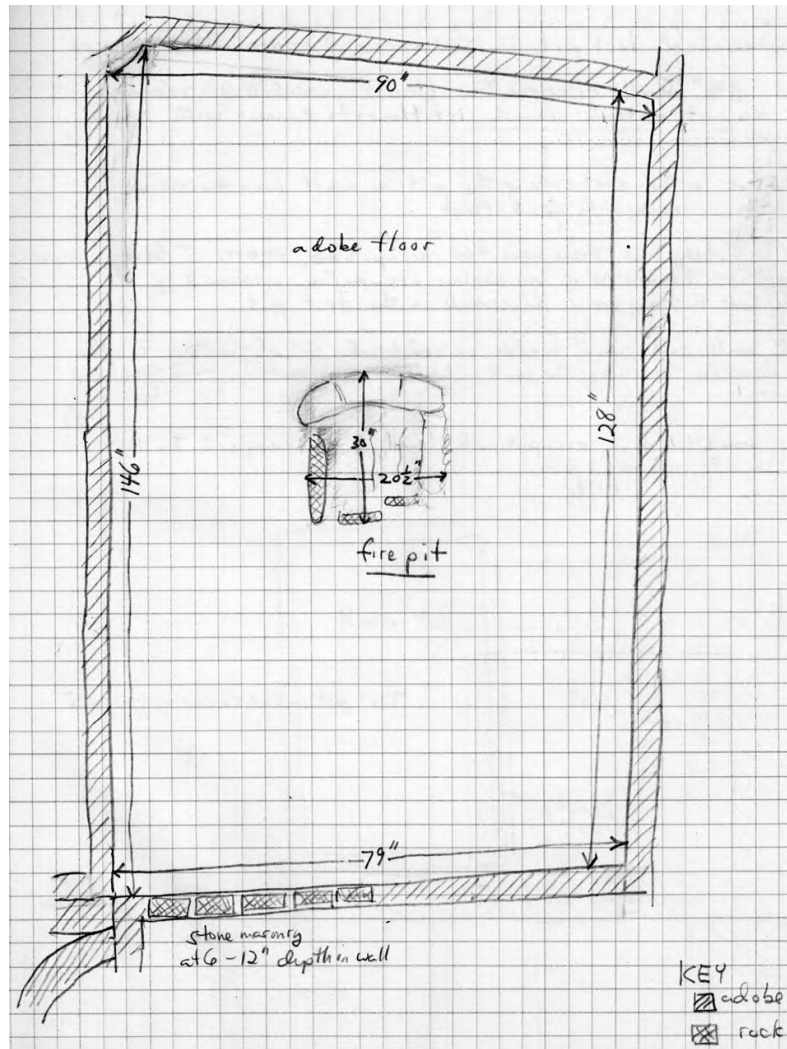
Room 5 at Floor 1. Source: Cat. No. 2003.25.40.
